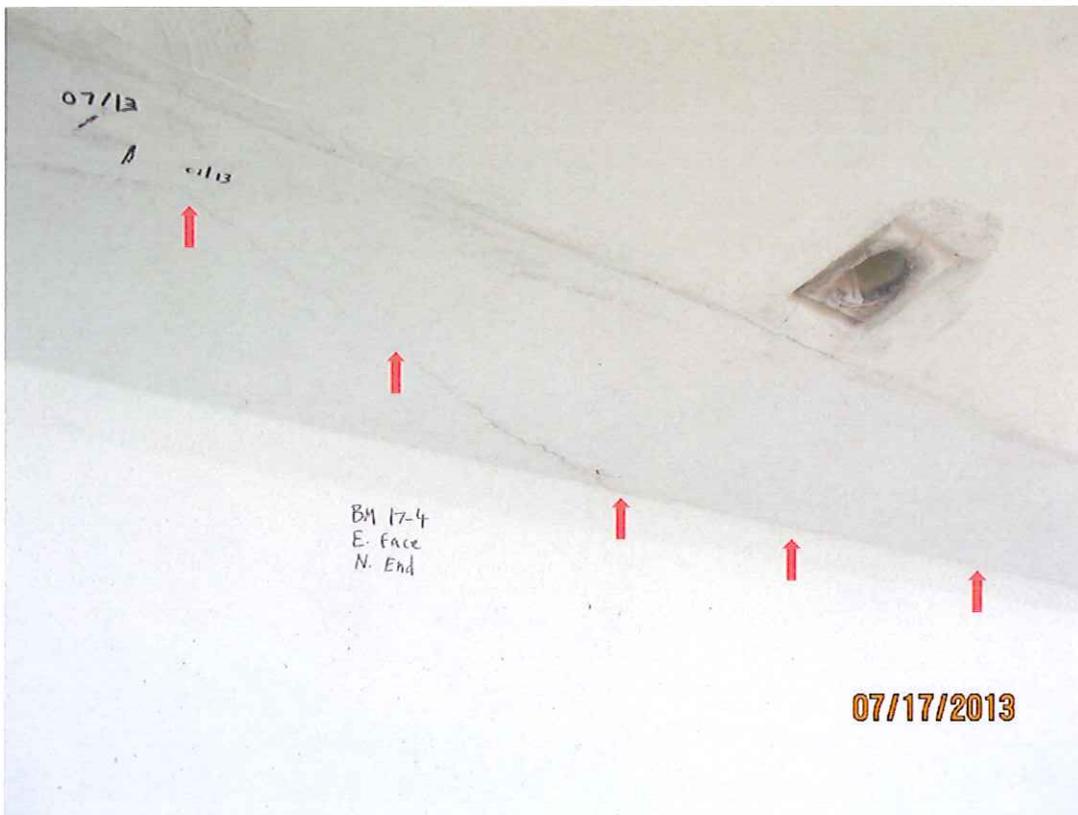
Longitudinal and diagonal crack in east face of Beam 17-4 along top flange
